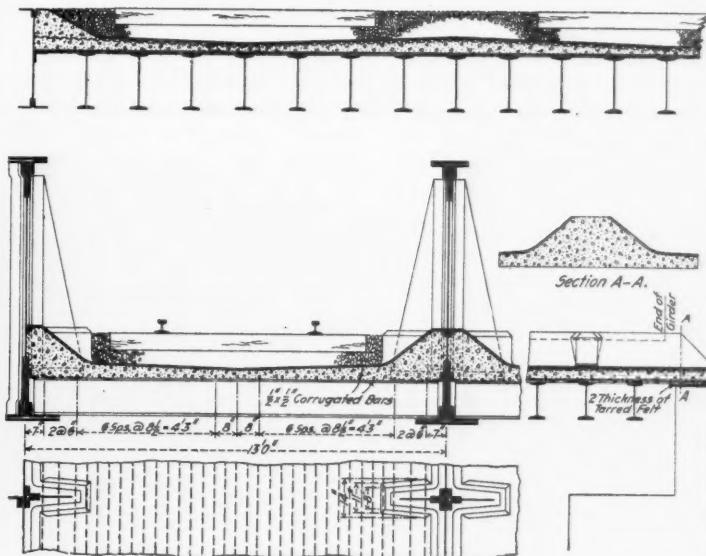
Bridge Floor Details; Chicago Junction Track Elevation.
